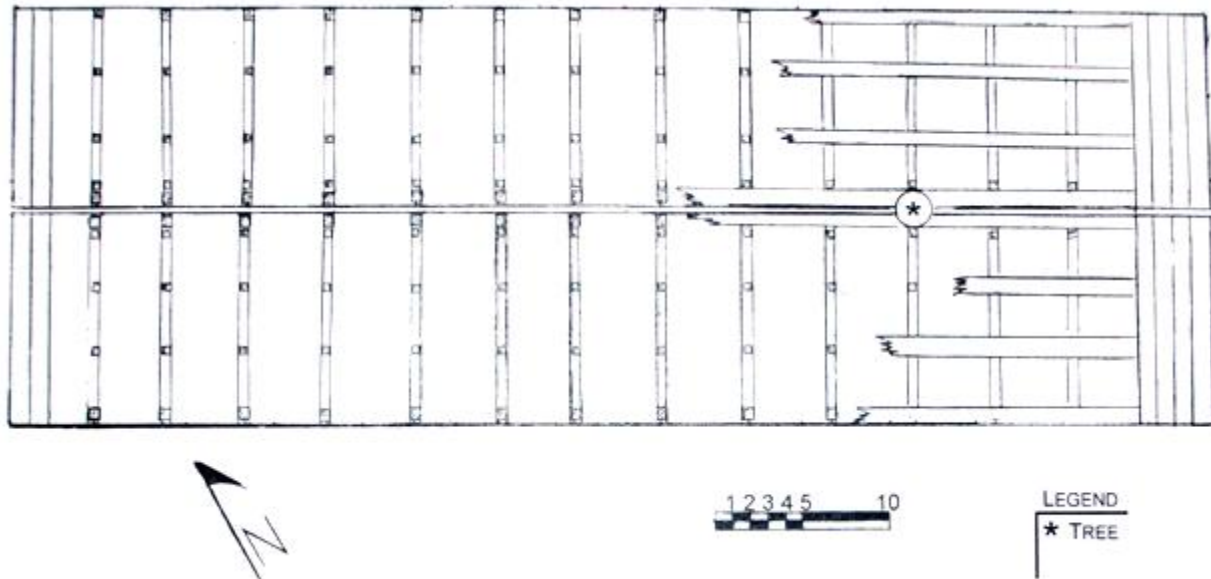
Site 0062PQR site plan (Lengieza 2009).
